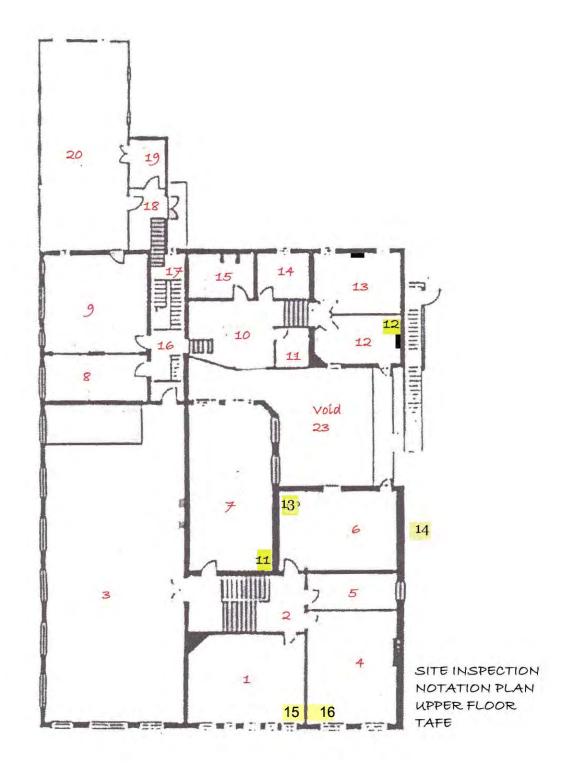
Part 8: TAFE upper floor plan - site inspection notation
